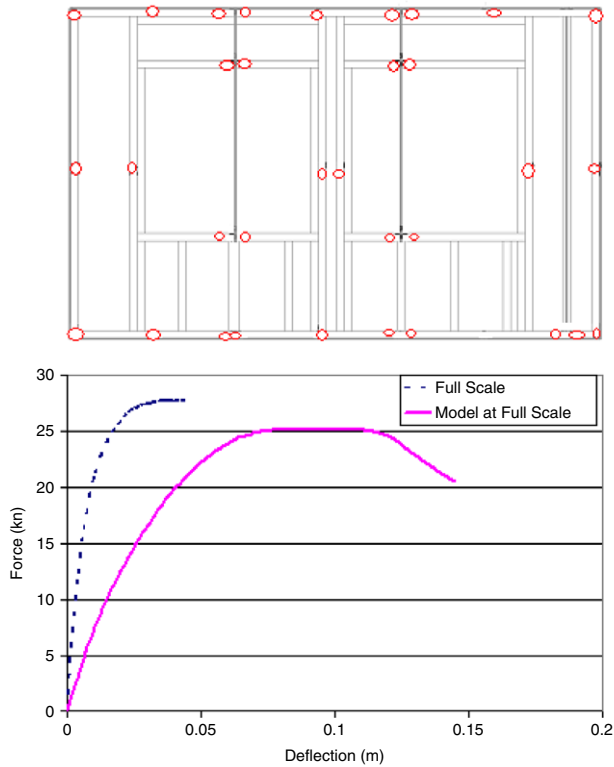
Comparison at full scale between the one-sixth scale model and the prototype (both shown at full scale) based on the SAPWood model prior to testing.
